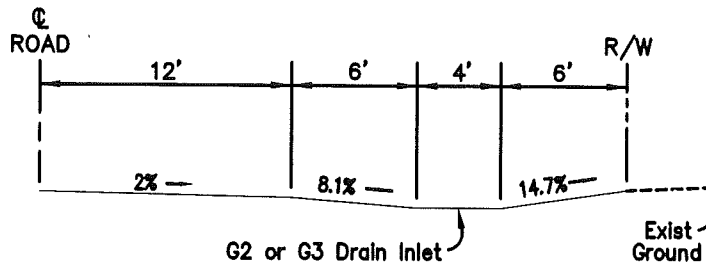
Trapezoidal Cross-Sections at G2, G3, G4 Drain Inlet for Dead-End, Minor, Collector Roadways
